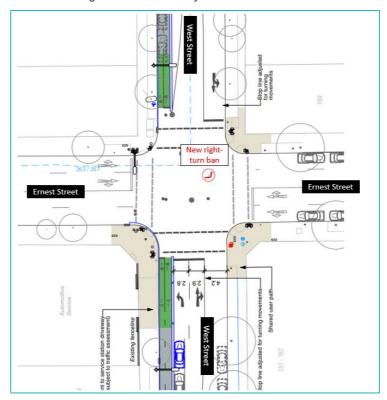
Proposed plan of Ernest and West Street Intersection
